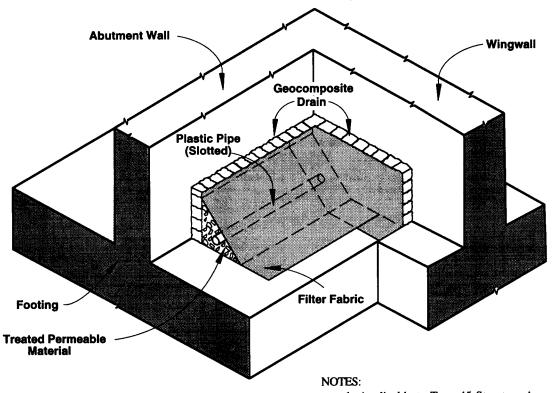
D Abutment Drainage Details<sup>2</sup>
